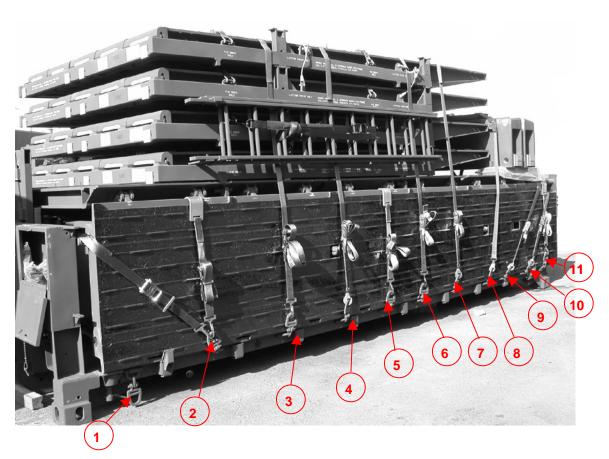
107 T1 - Strapping of Approach Ramps and End Beams
